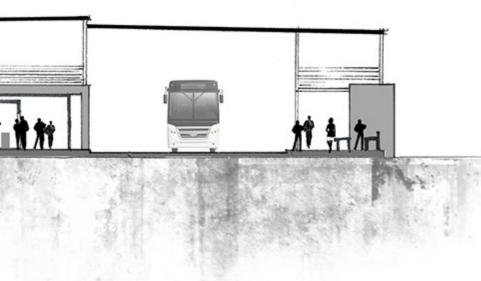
Western Elevation of entire building (breaking and continuing on next line - scale not as indicated) (Author 2017) Figure 04.16: A North-South section through the spinal walkway (Scale NOT as indicated) (Author 2017) Figure 04.17: East-West section through the transport nodes showing the relationship between bus and taxi stops (Scale NOT as indicated) (Author 2017)
